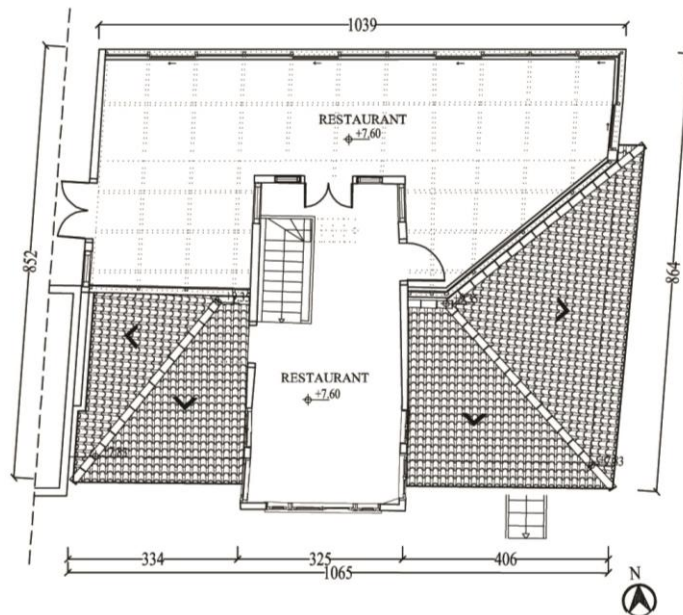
The second floor plan of Boyacızade Konağı in 1/100 scale (Redrawn by author).
